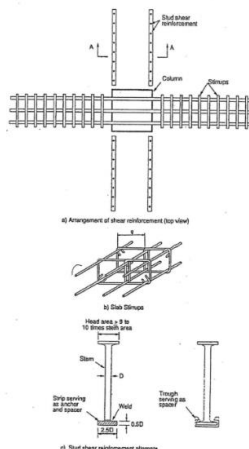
Arrangement of shear studs in raft foundations and other reinforcement in a wall
